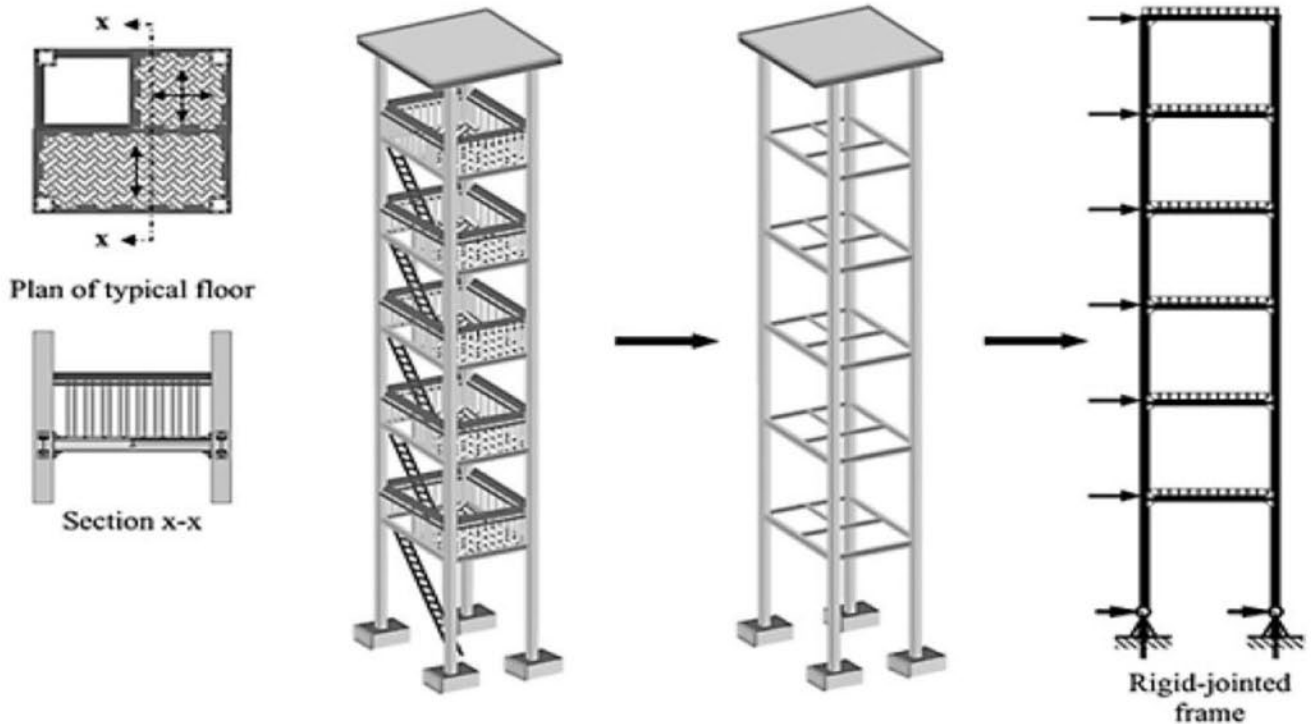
Idealization of a Steel Observation Tower (Sub-Fame Model)
